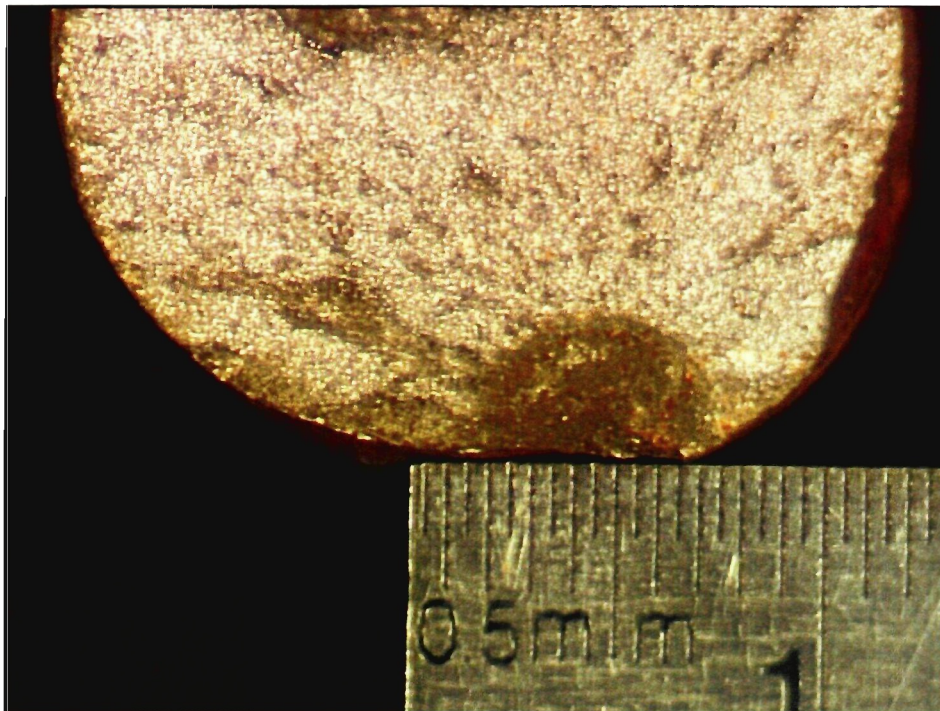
Macroscopic view of rock bolt's fracture surface at higher magnification
